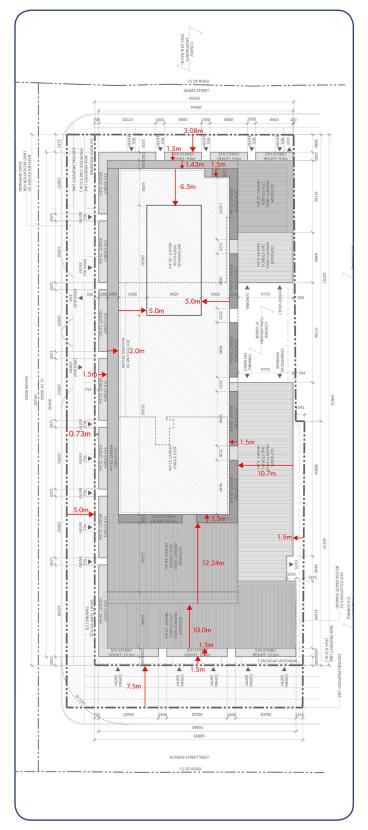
Ground Floor Plan Illustrating Key Setbacks: Prepared by Studio JCI.
